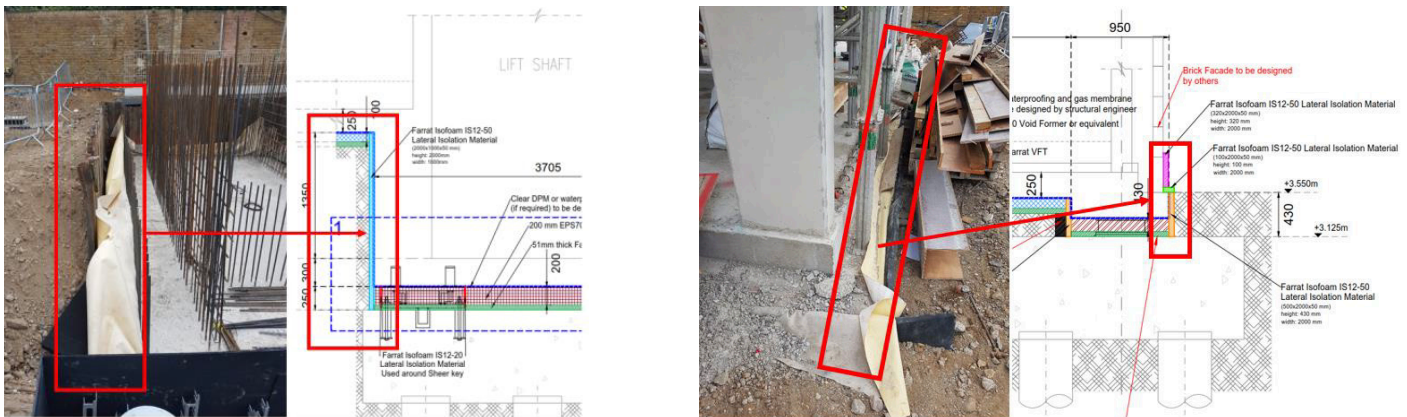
Typical examples of the challenges of constructing robustly isolated details
